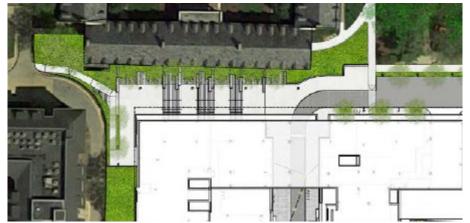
Grand staircase that will connect Lehigh Road to UMD Campus to the west.
